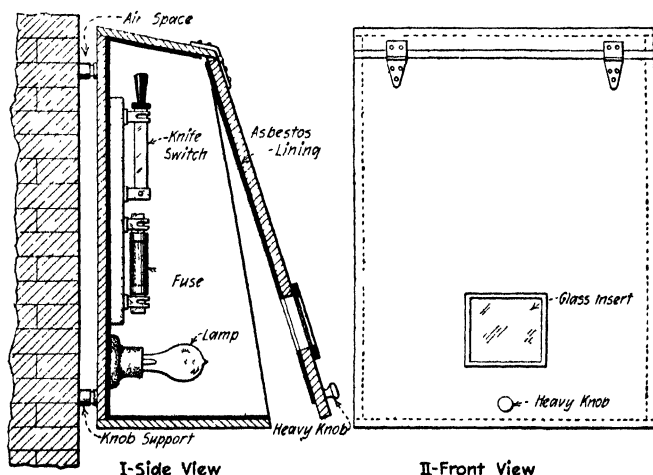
Knife-switch-and-cutout cabinet for damp places.
